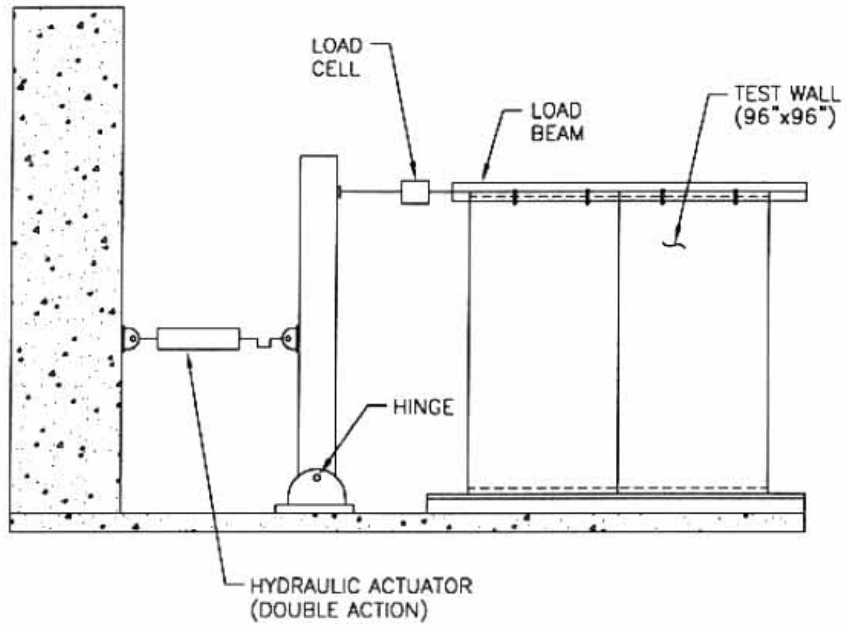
Test Setup for Cyclic Load Plywood Shear Wall Tests
